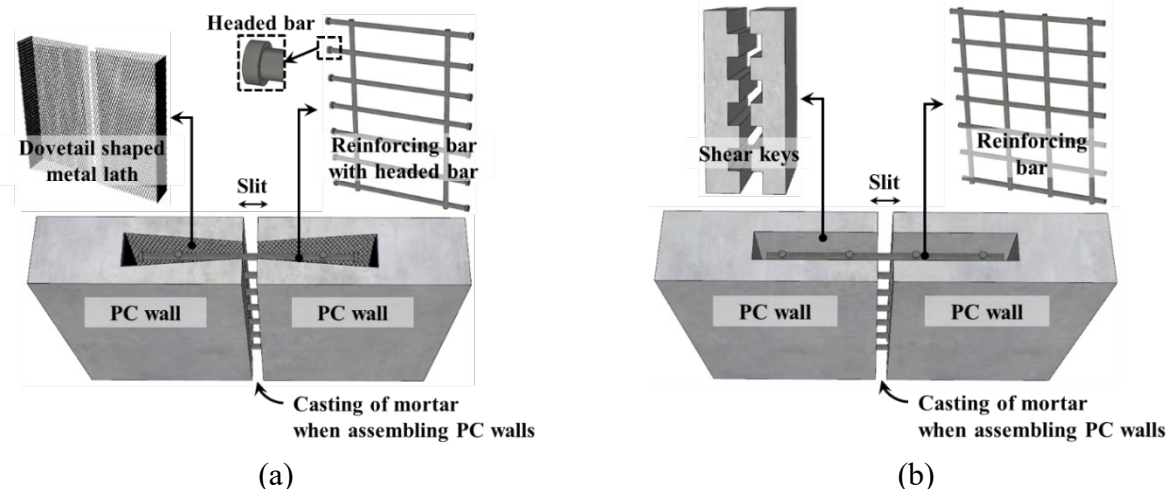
Developed vertical connections; (a) Dovetail-shaped connection; (b) Connection with rebars and shear keys
